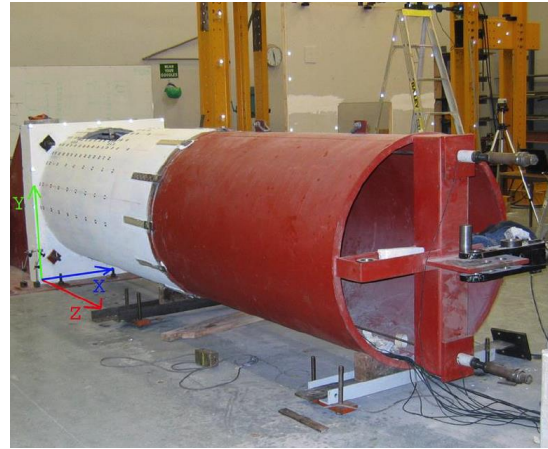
Cyclic loading test setup of the reinforced concrete chimney section at the University of Melbourne [3]
